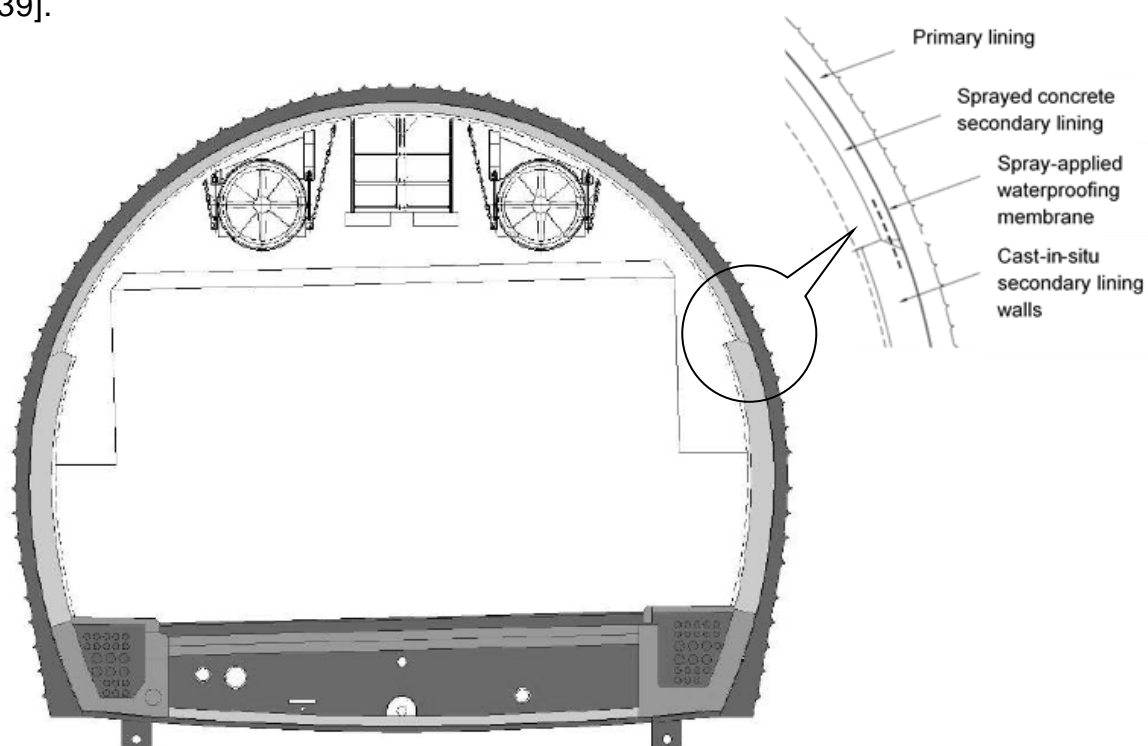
Typical Hindhead tunnel cross-section: 1. SFRS Primary lining 2. Spray applied membrane 3. Sprayed concrete Secondary lining 4. Plain cast in-situ concrete walls, [40]
